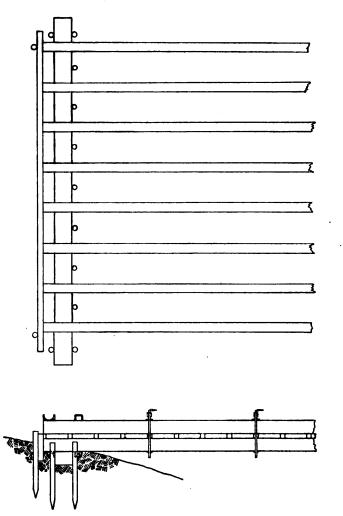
Abutment, with trestle balk resting on sill and chess used as end dam.
